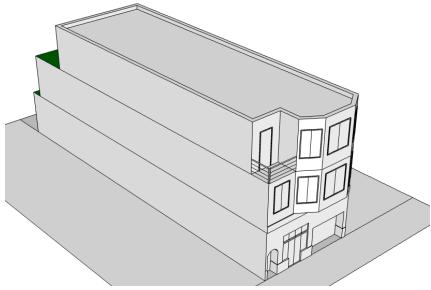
NCRO-2 Building Design Under Proposed Objective Standards
